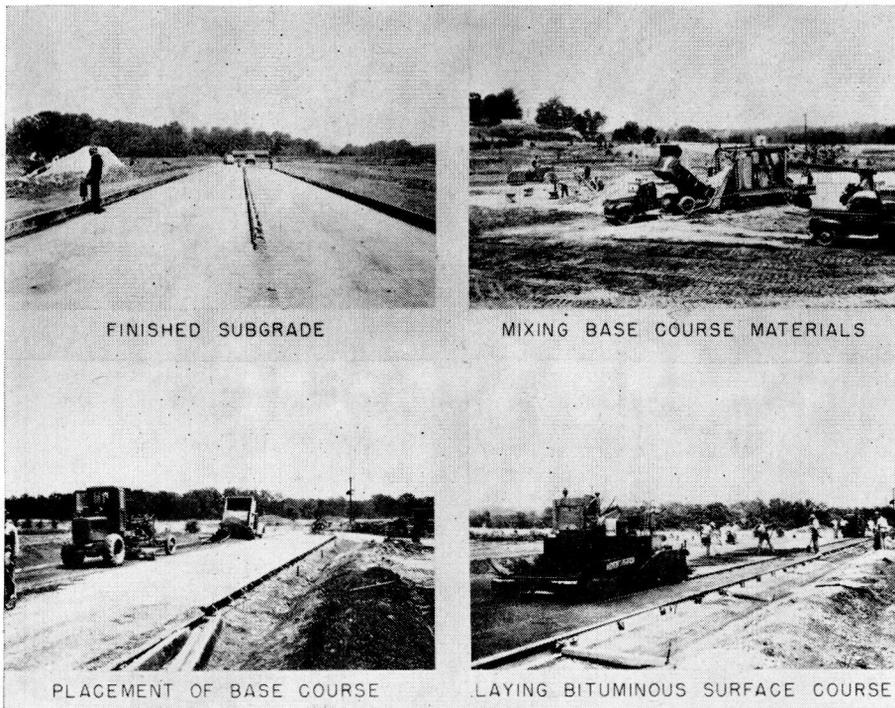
Typical Construction Views of Auxiliary Test Pavement
